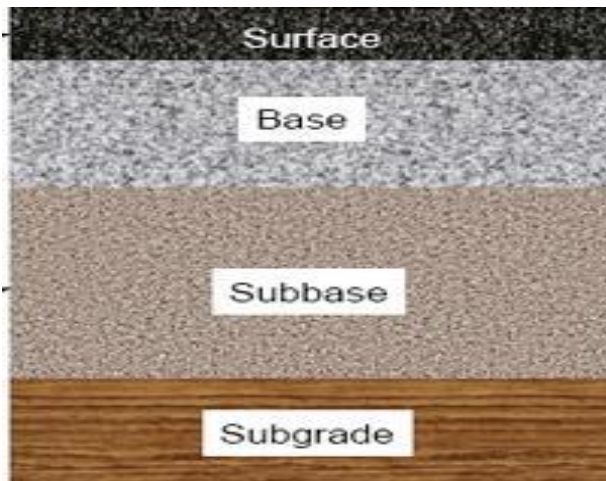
Structural layers in an asphalt concrete pavement [9].
